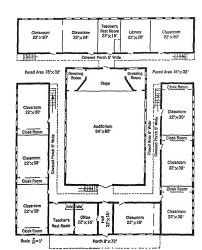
FIGURE IV. FLOOR PLAN FOR A CONSOLIDATED SCHOOL—ELEMENTARY
